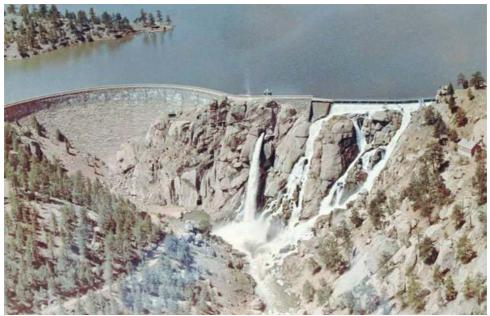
Aerial view of Cheesman Dam (photo courtesy Denver Water Board).
